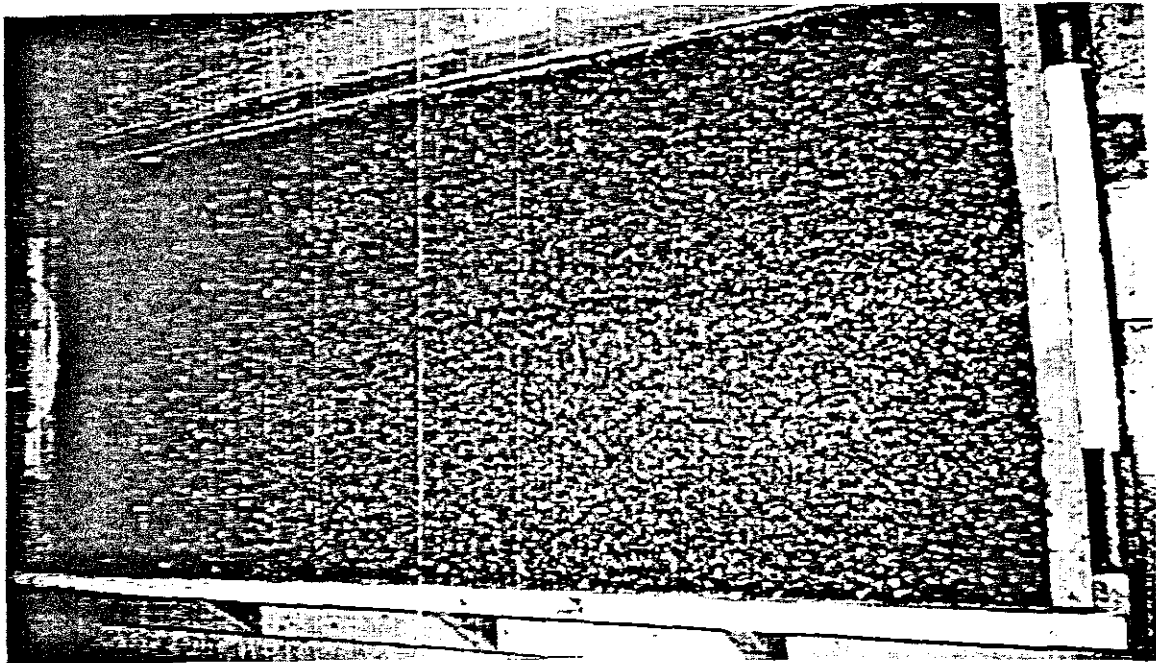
Slab after rutting test and the wooden mould used for rutting test
